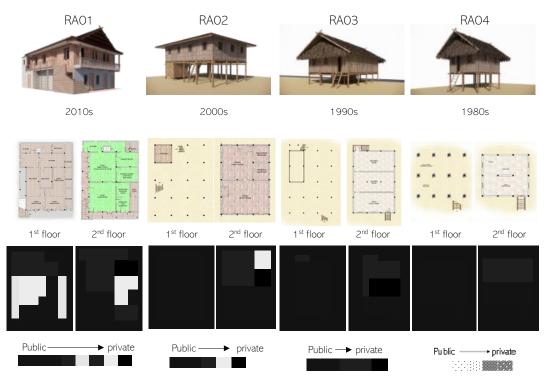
RA's houses in Kampung Air with 3D render, floor plan and layout analysis
